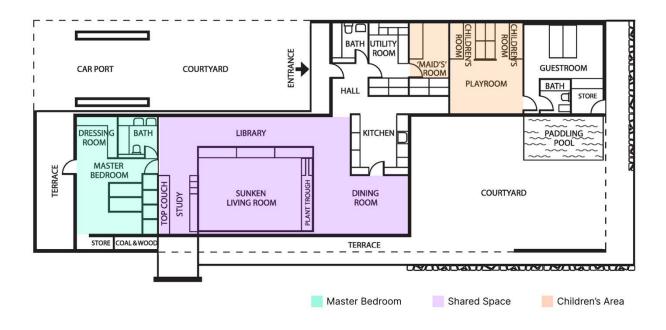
Floor plan of High Sunderland, adopted from Klein, Shelley. "The See-Through House: My Father in Full Colour". 2021. Page. x. Colour markings and legend added by thesis author.
